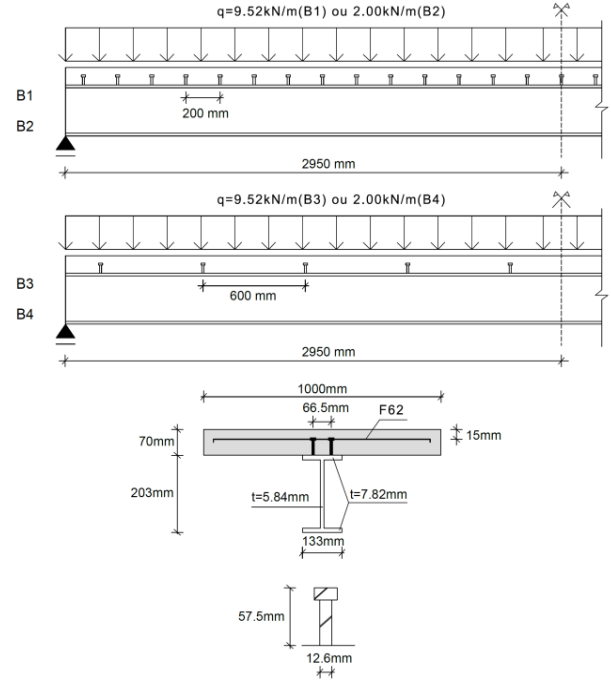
Geometry and cross-section of beams B1, B2, B3 and B4
